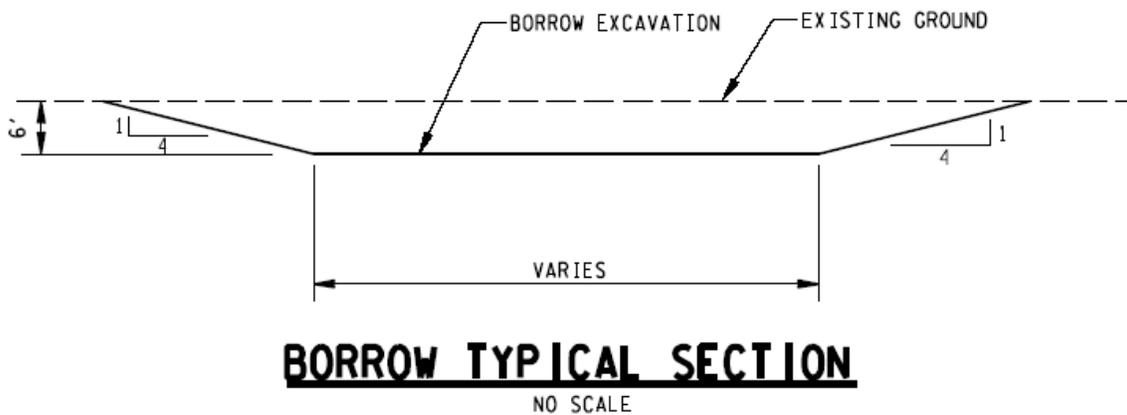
Typical Cross-Section for Borrow Area 1.
